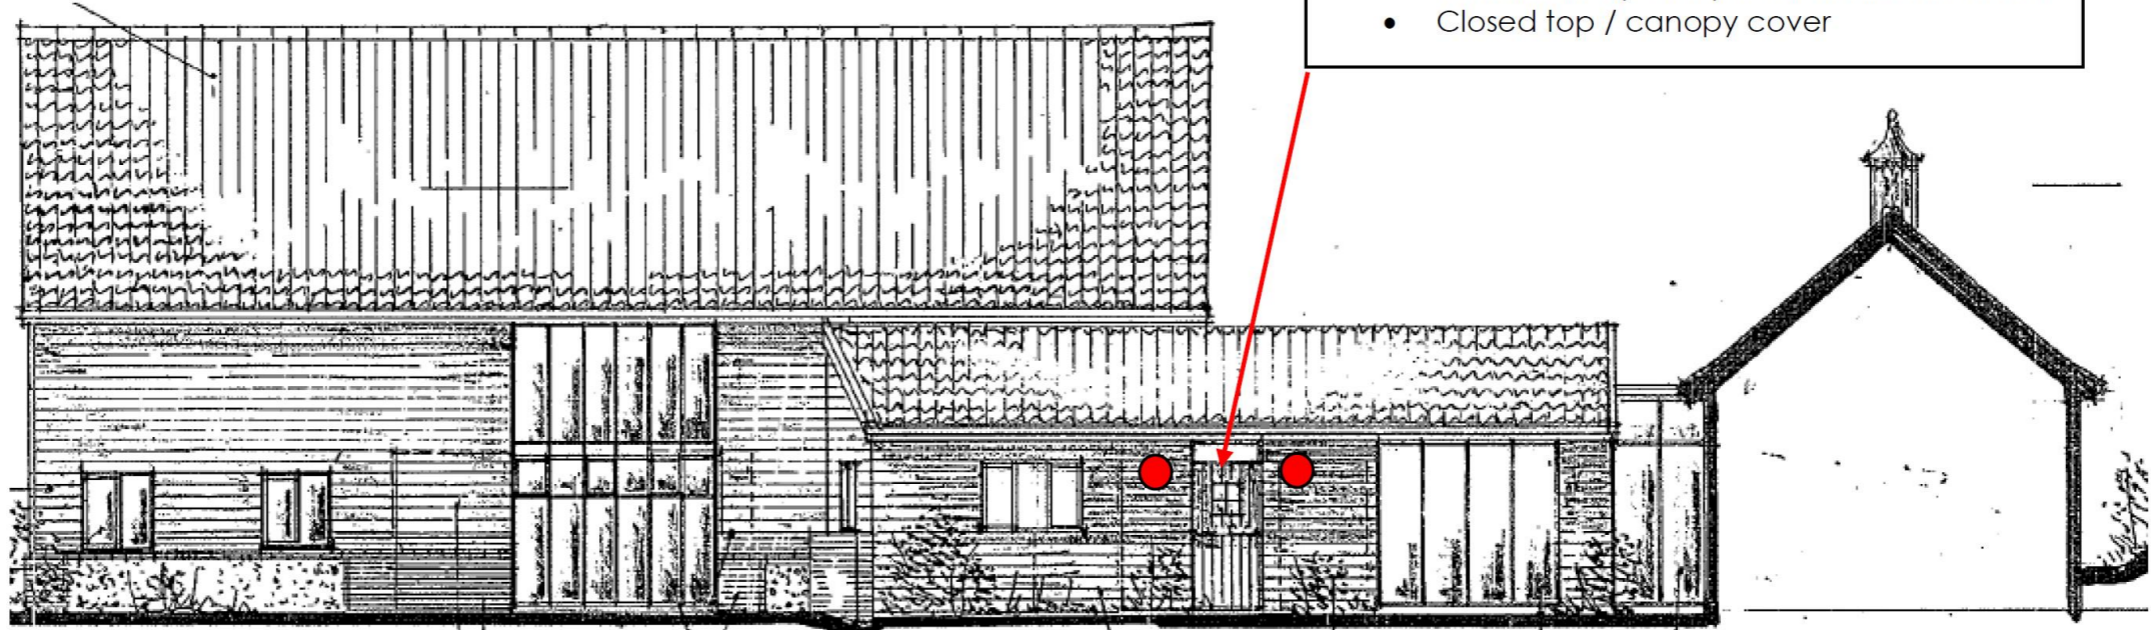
Mitigation Layout & Elevations - Gibbons Farm Barn, Hascot Hill, Battisford, Stowmarket, Suffolk IP14 2HJ
